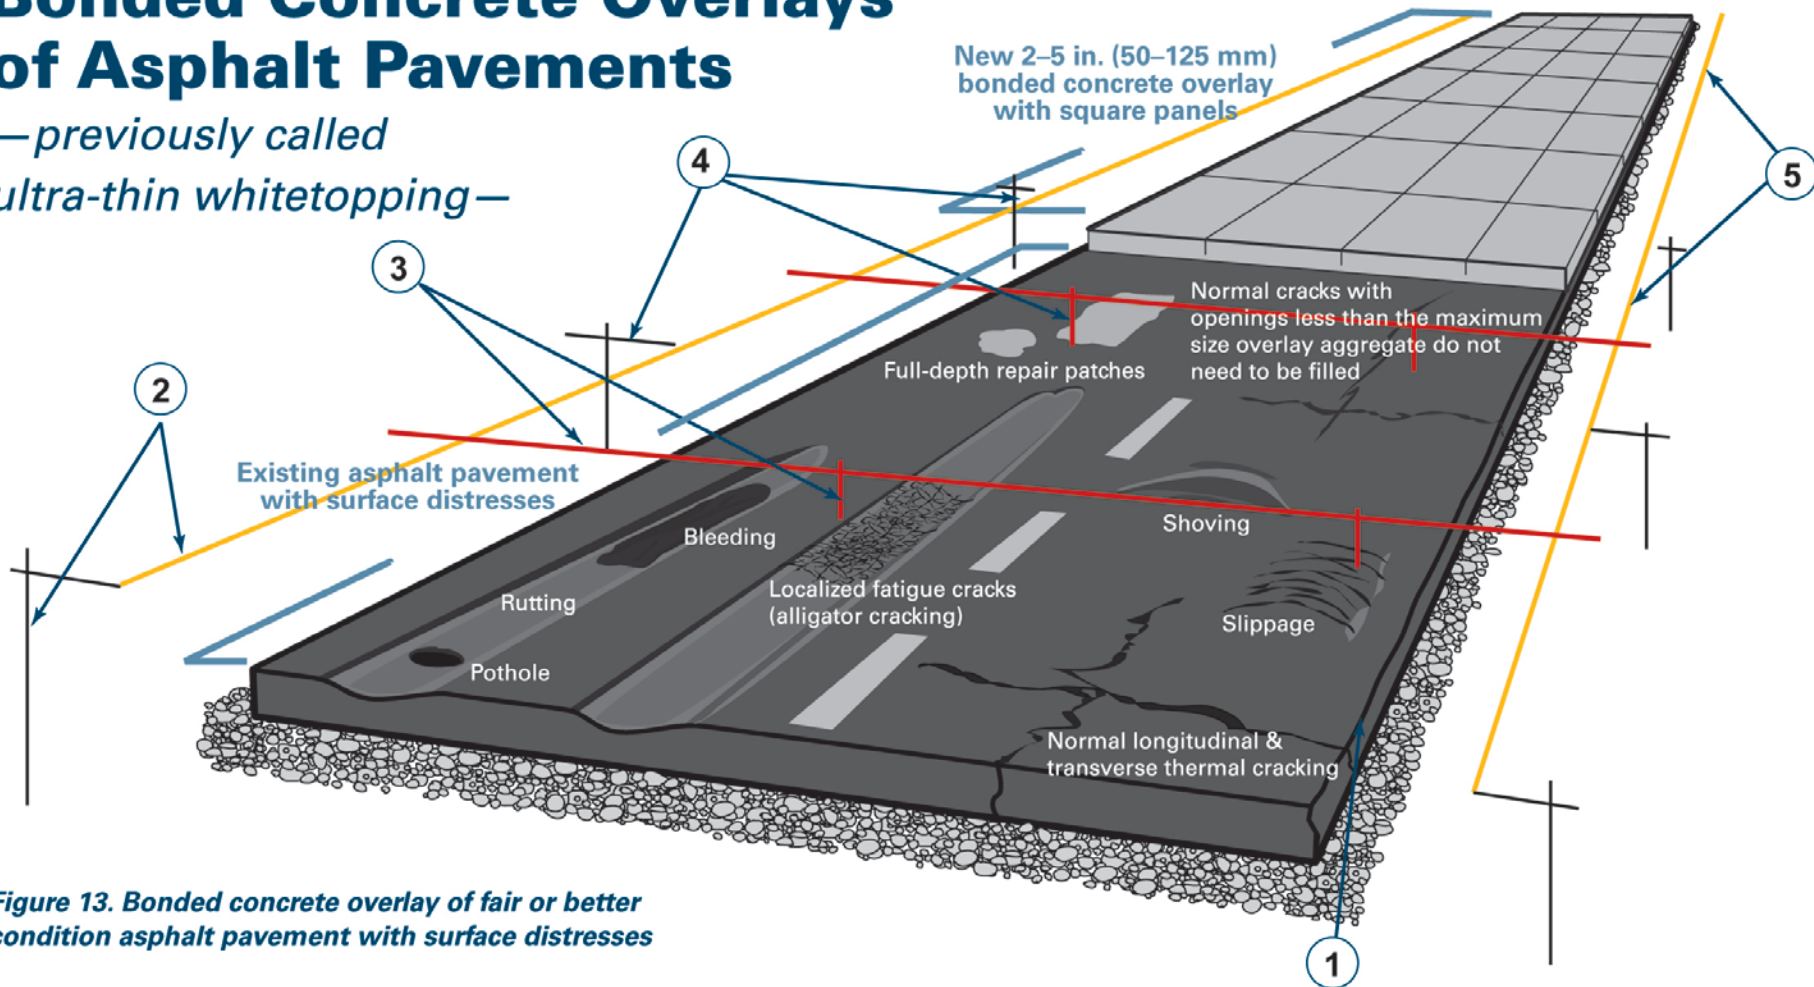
Bonded concrete overlay of fair or better condition asphalt pavement with surface distresses
